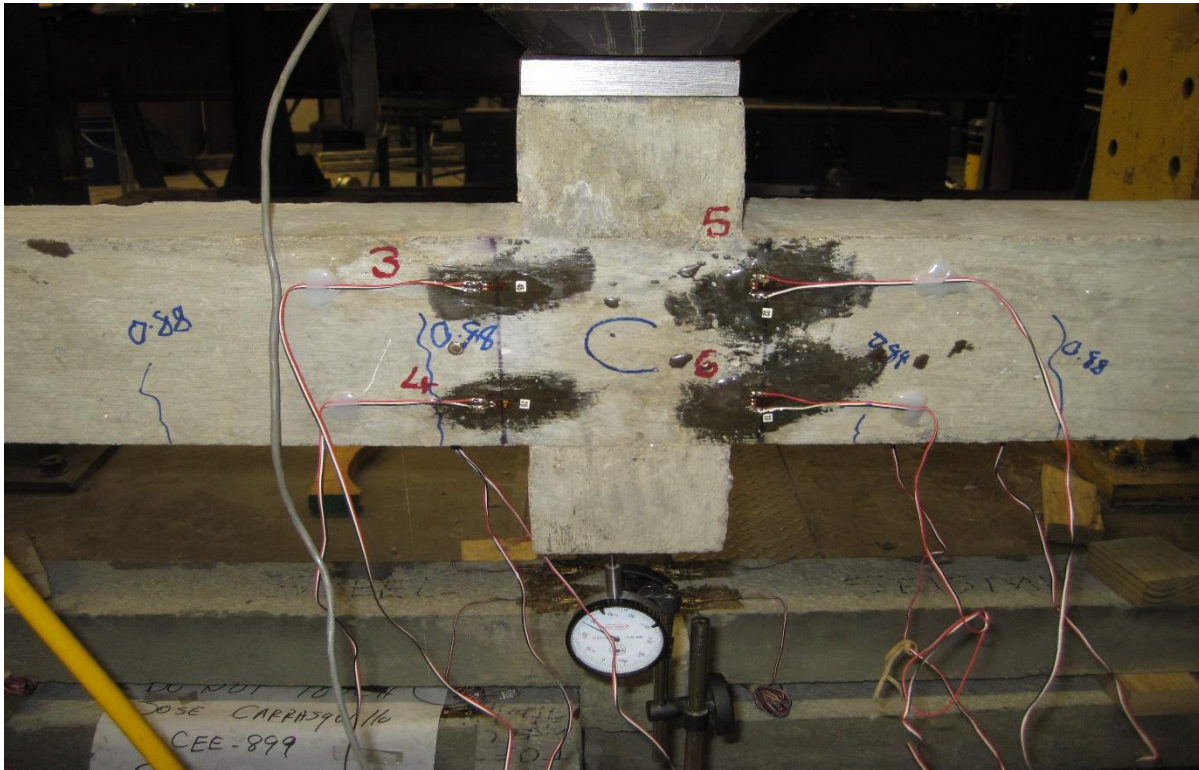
Crack Pattern on the Missing Column for Specimen B2-2
